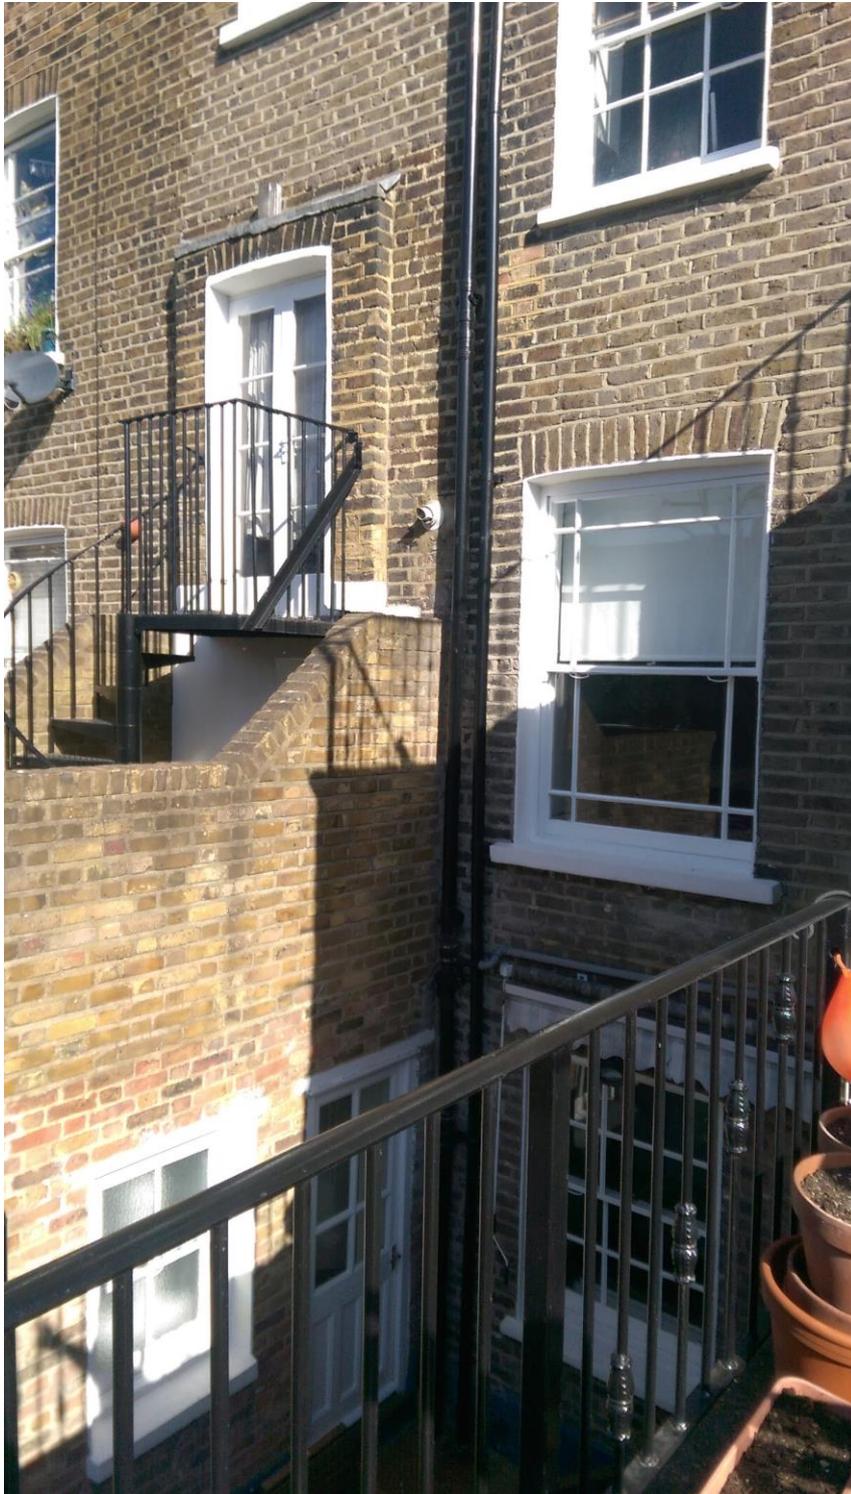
Rear elevation of the adjacent building at 140 Agar Grove (right of image)
